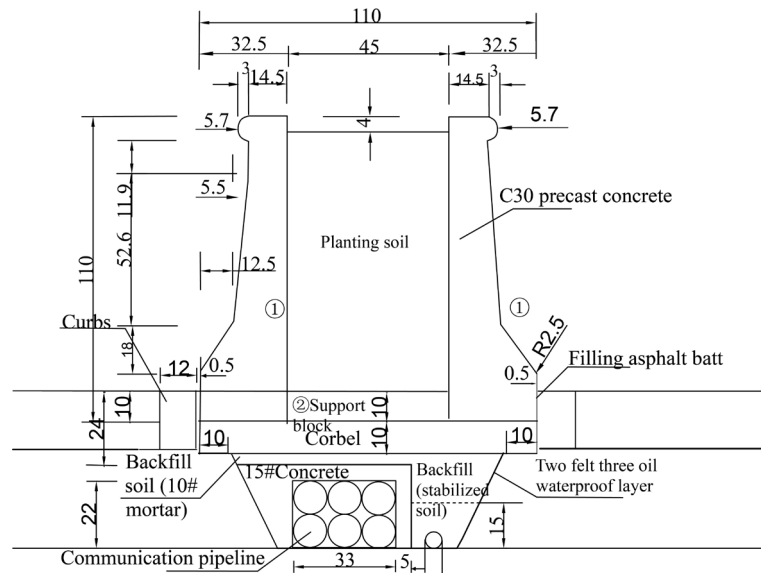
Sectional view of the guardrail of the Minhua II central divider belt.
